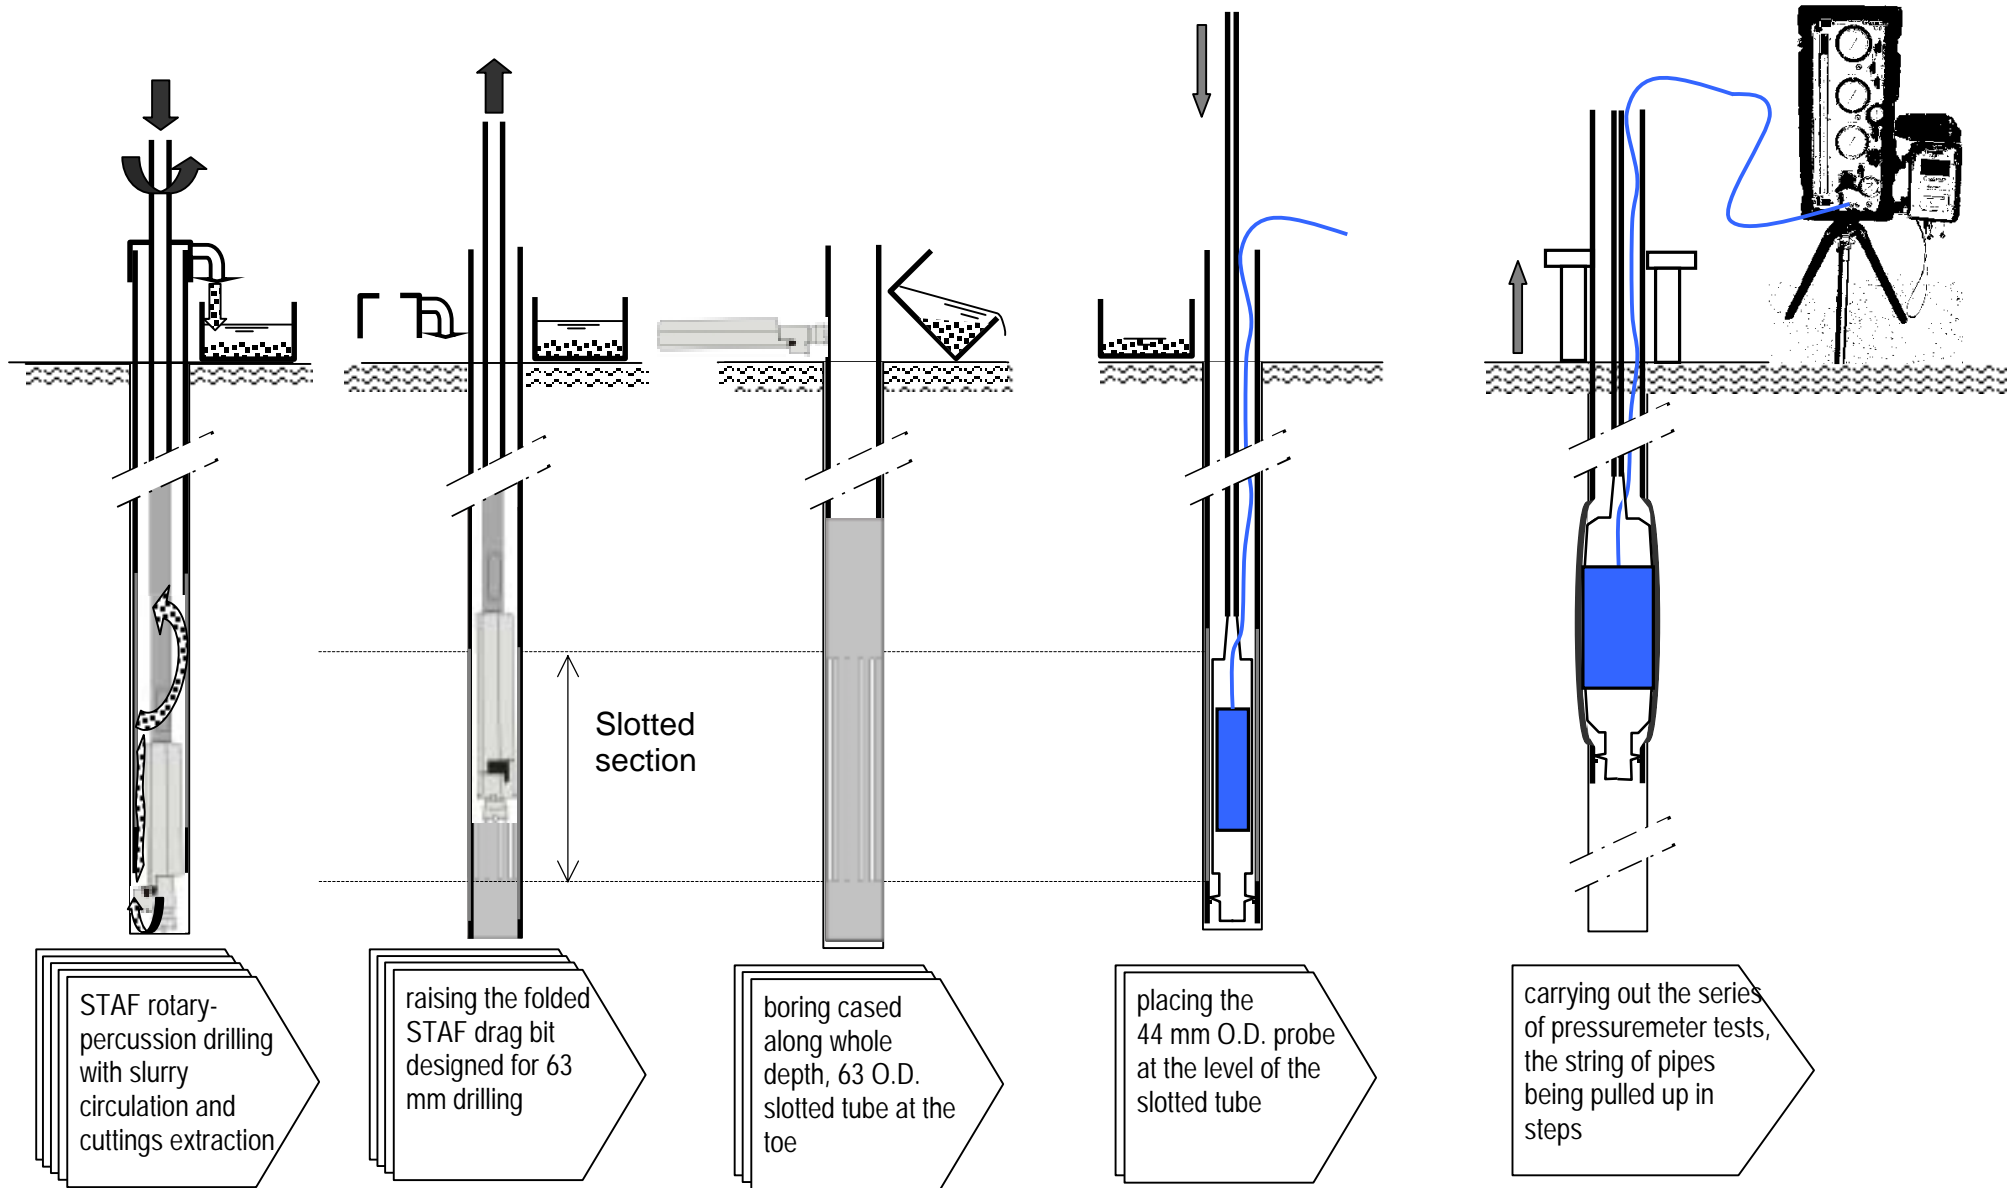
Sequences of the STAF® technique to perform Ménard pressuremeter tests by self-boring of a slotted tube
